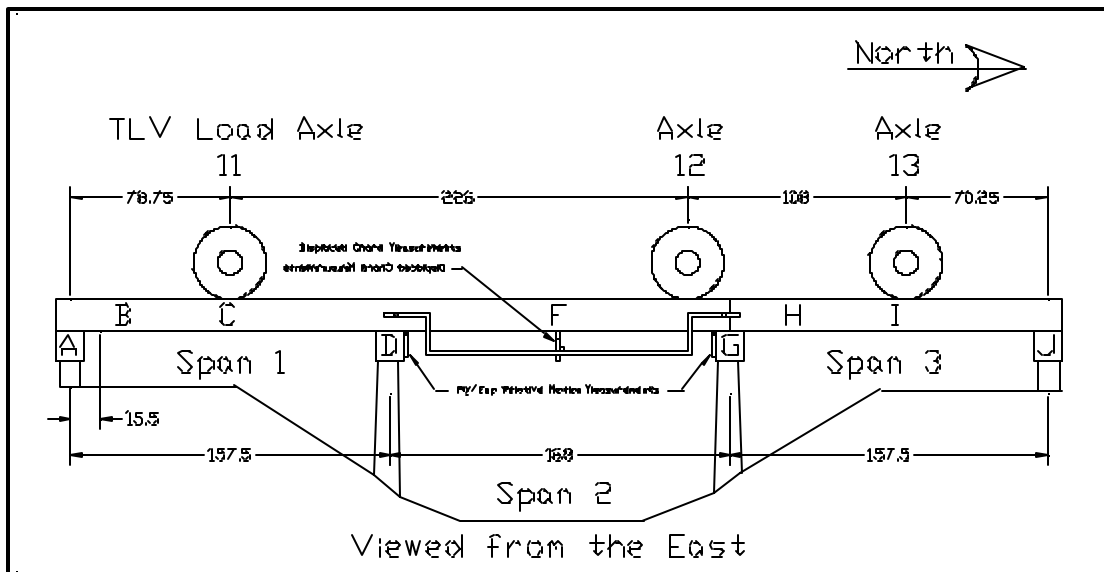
Load positioning on Bridge 101 for 11@C. Dimensions are in inches.
